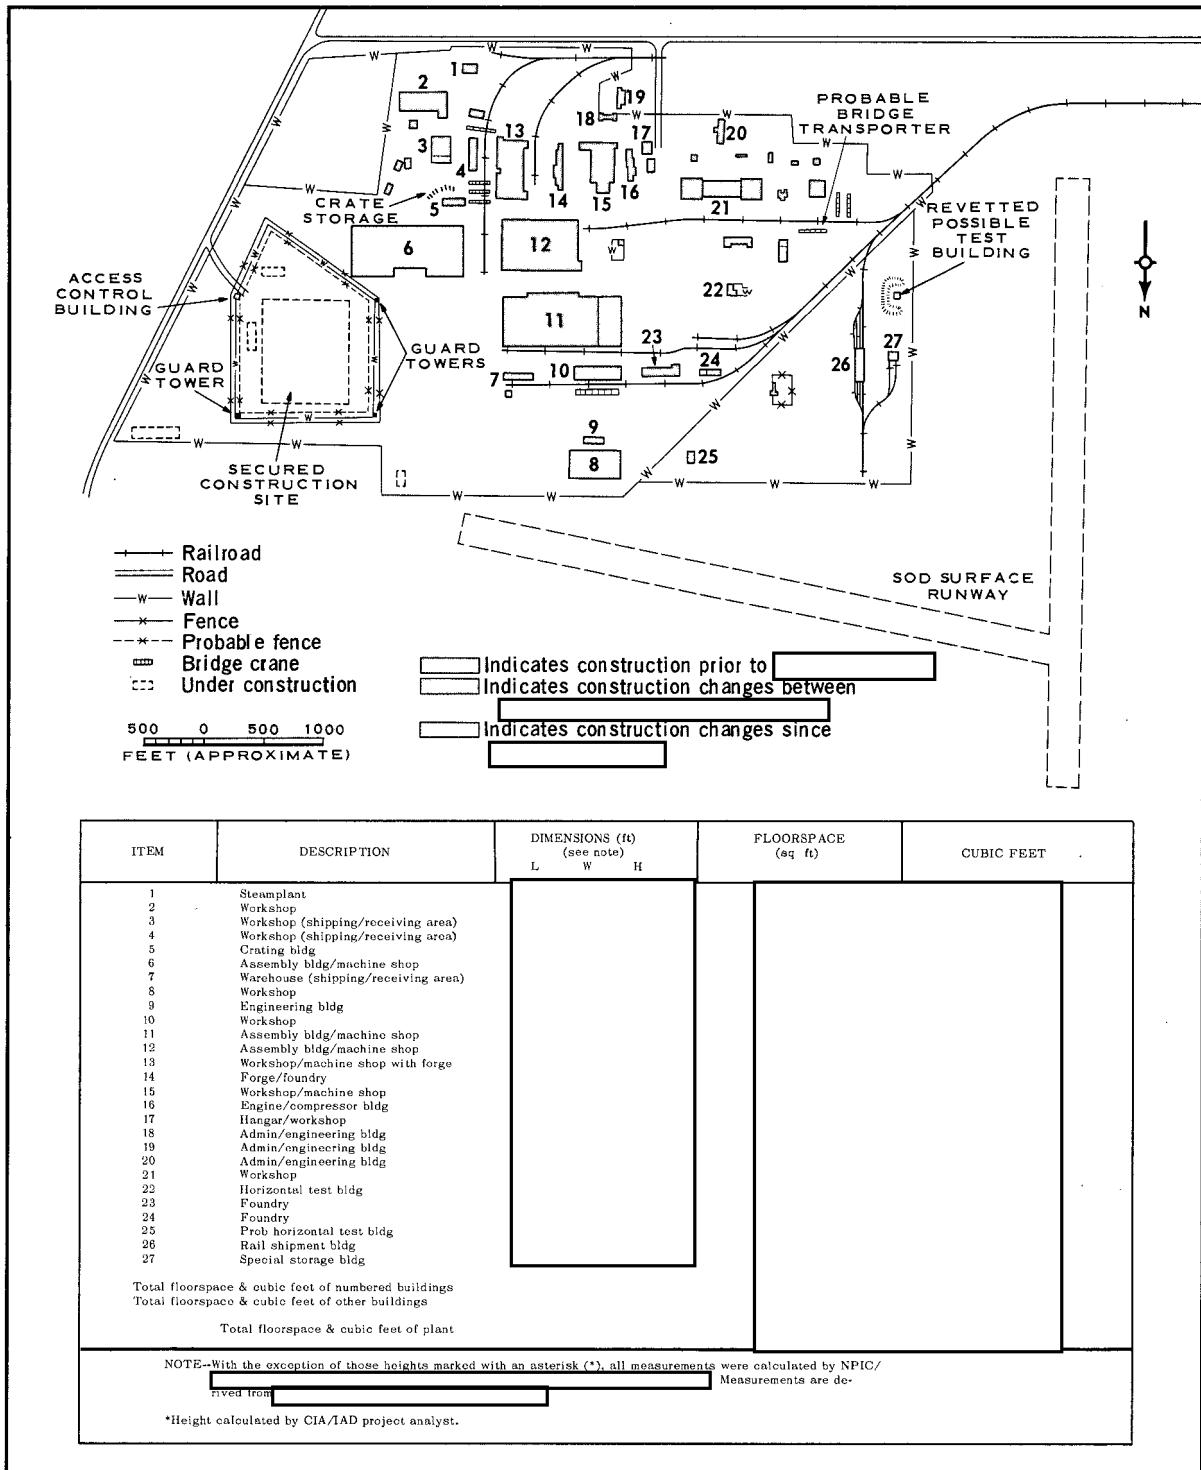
LAYOUT OF ORENBURG AIRFRAME PLANT NO 47.
